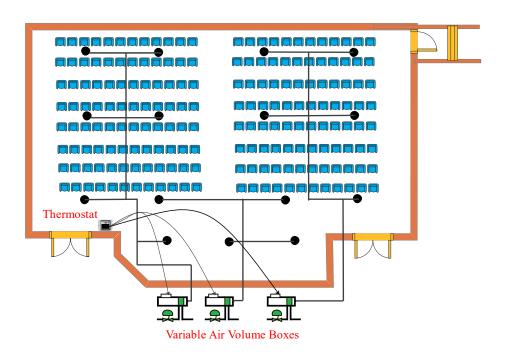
The elect classroom located on the ground floor of the ETLC building
